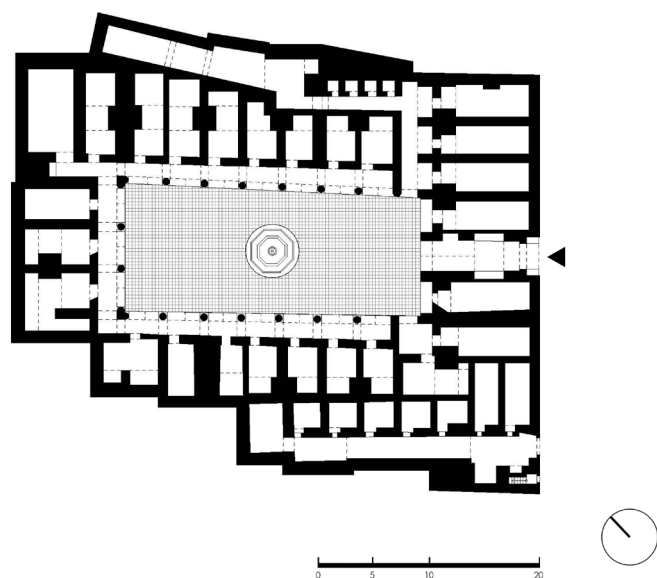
Ground floor plan of the Wikala al-Ghuri. Cairo (Manlio Michieletto, 2025)
